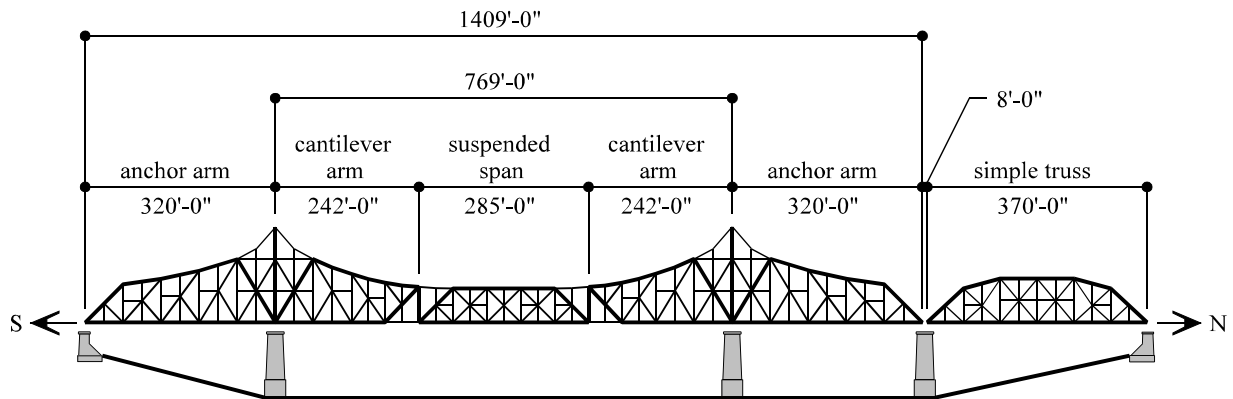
East elevation of Beaver Bridge. Sketch by author.
